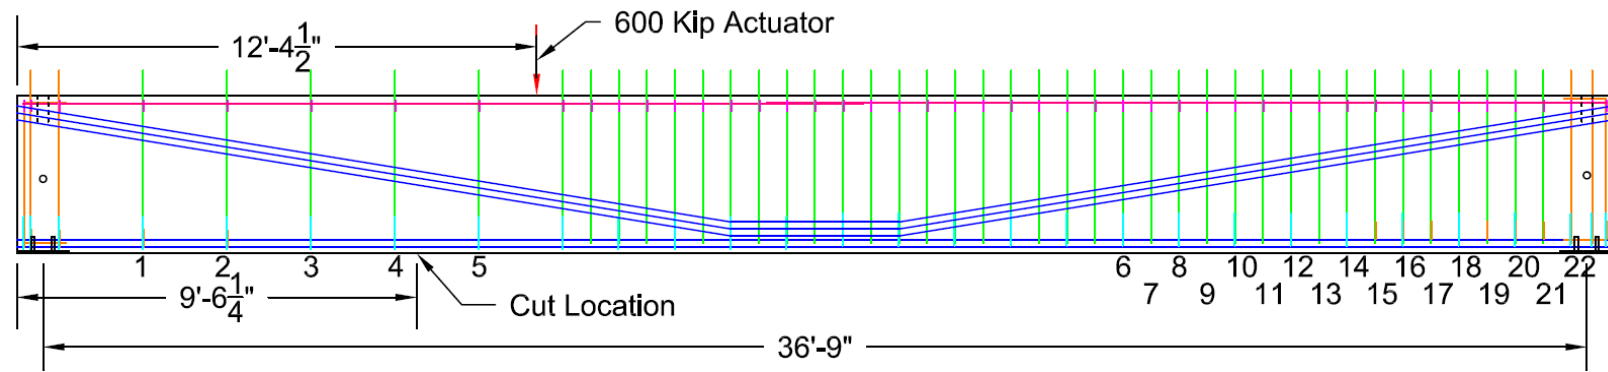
Elevation view of cut location after 45M₂₄W test.
